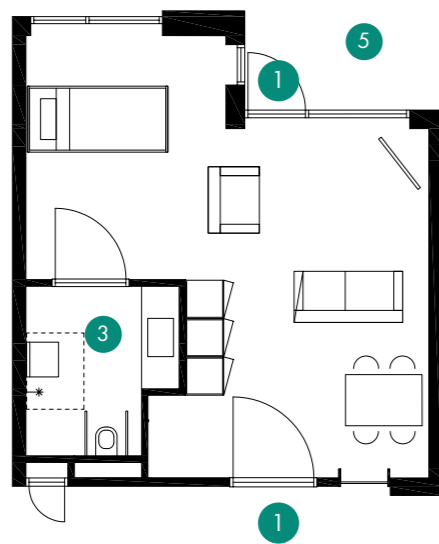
Zierik 7 apartment plan (Scale - 1:200).
